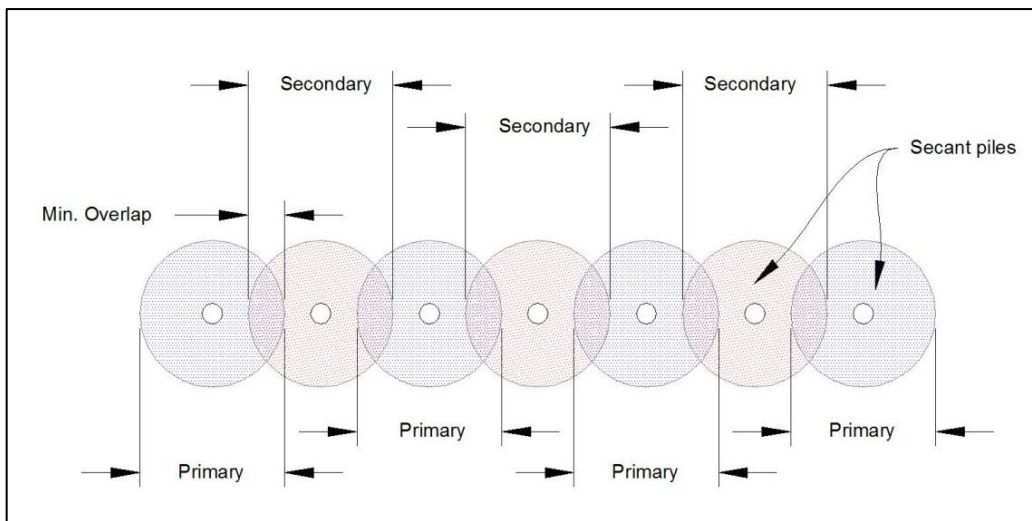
Schematic of general sequence of secant pile cutoff wall segments.
